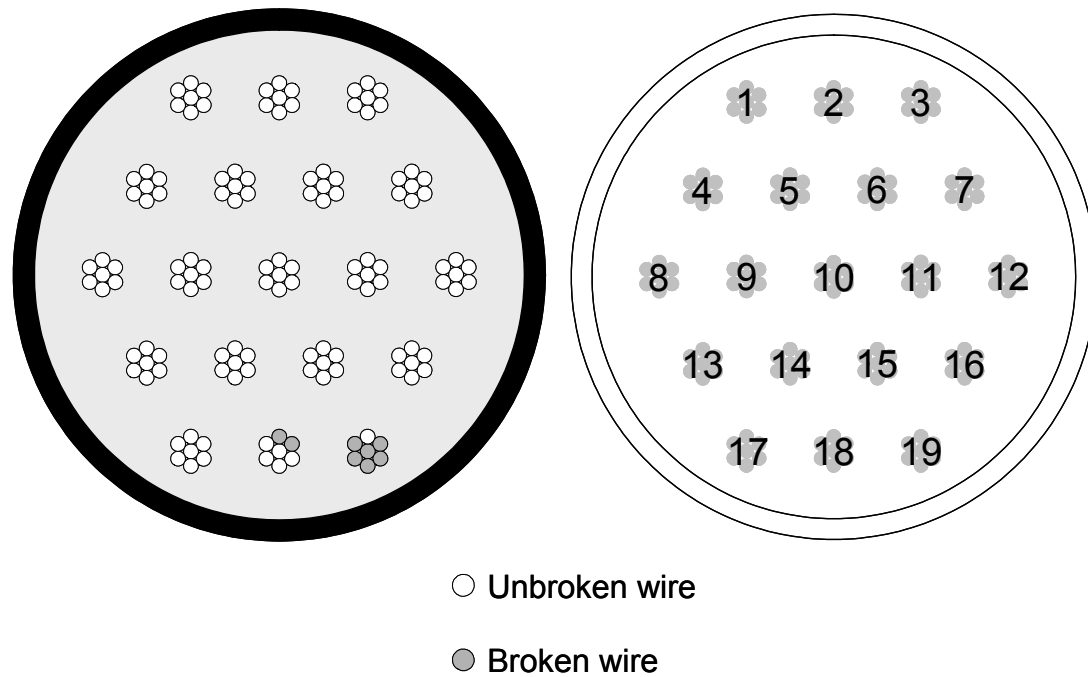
Wire breaks near the deck anchorage - Specimen 10
